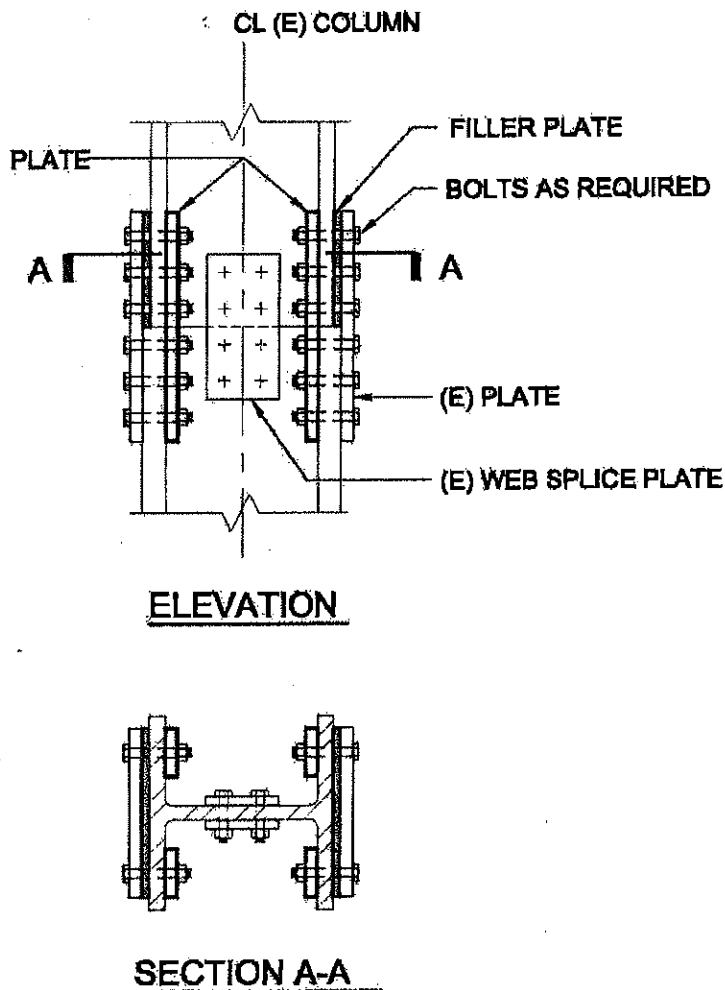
Bolted Splice Upgrade at Existing Column
